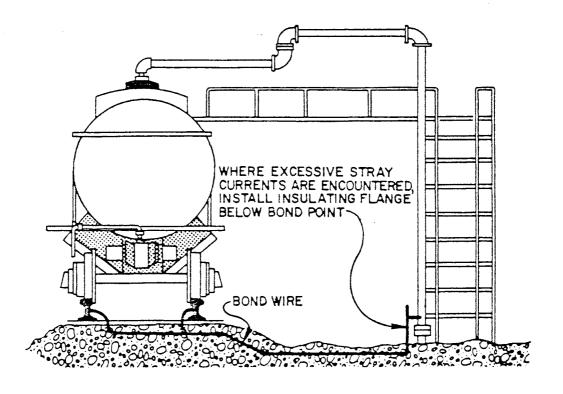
Bond Rails of Tank Car Loading Spur to Piping API Illustration
